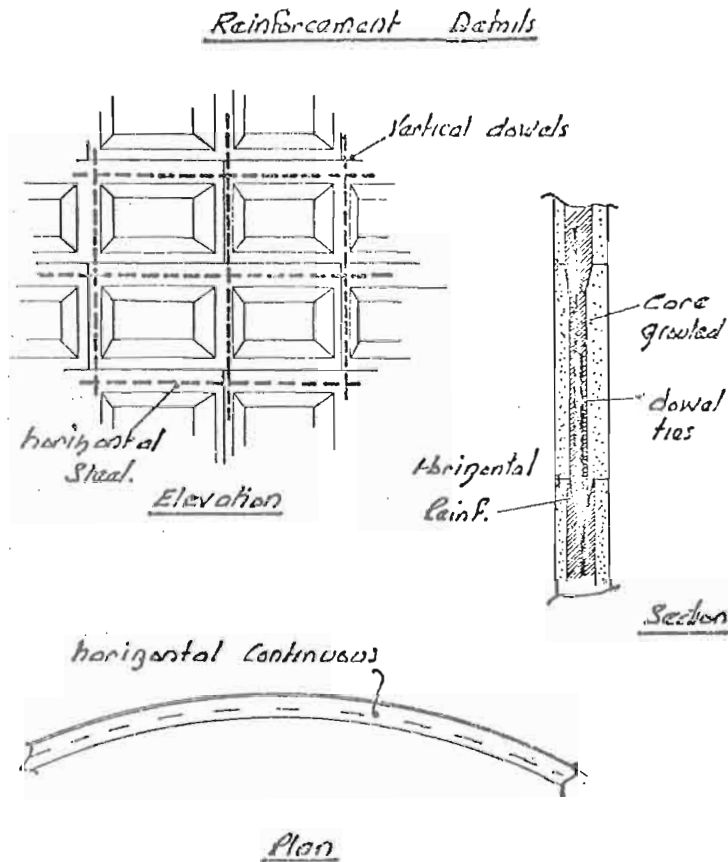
shows the general construction of an INKA tank built as a single wall applicable in the diameter range of 4 metres to 18 metres. Figure 4 describes the layout and location of the reinforcement which is applied on site in the form of horizontal circular tension reinforcement and vertical dowel location reinforcement. As described, each element has a top level groove to allow the placing and location of the hoop tension reinforcement as a continuous spiral in one plane around the tank, grouted into position on site as each element lift occurs. The vertical groove in the element end corresponds to a central core hole in the centre of each element, as described in figure 1, such that the vertical dowel reinforcement may be passed continuously through each element lift, tying
